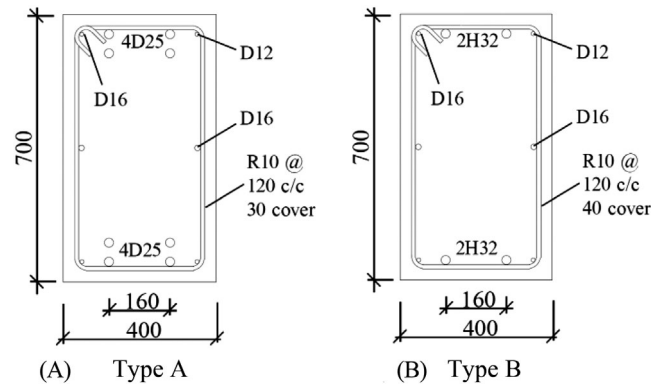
Cross-section of beam specimens (All D12 and D16 bars are curtailed as shown in Figure 1B).
